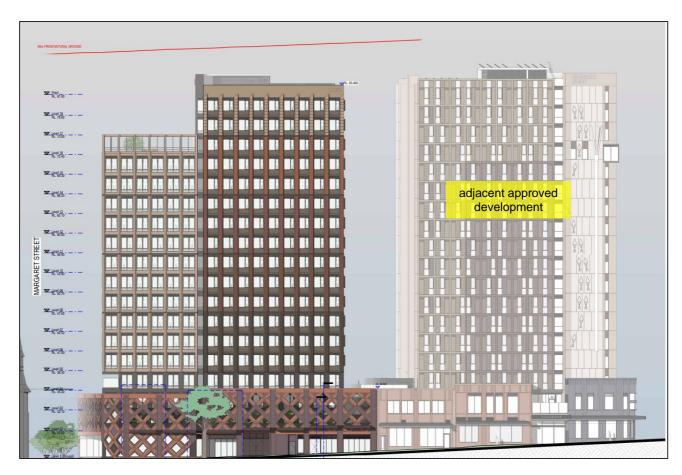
| Regent Street elevation (Source: Applicant's RRtS)
